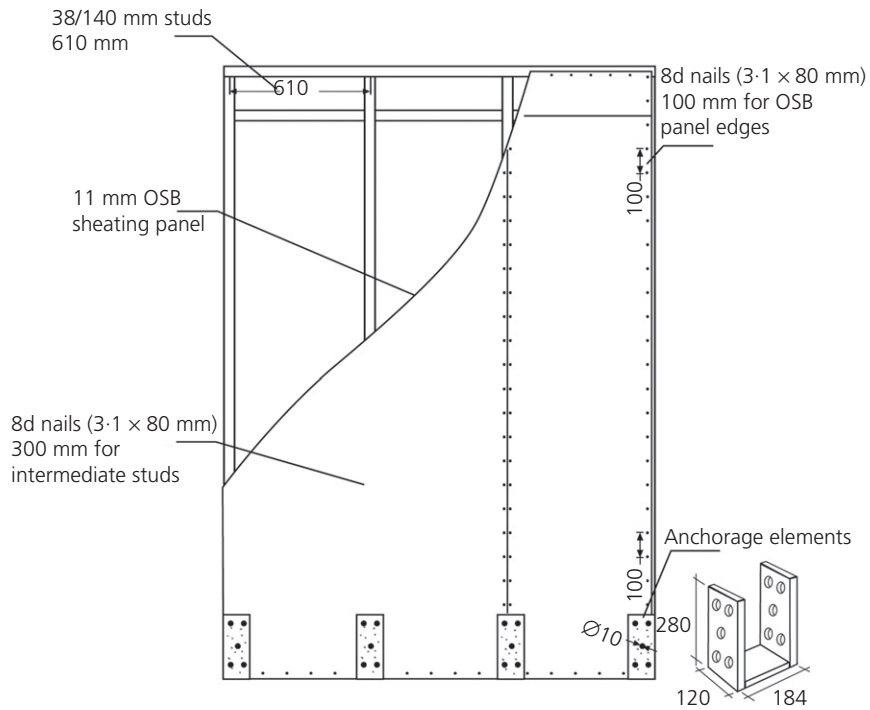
Schematic illustration of standard timber-framed shear wall (dimensions in mm)
